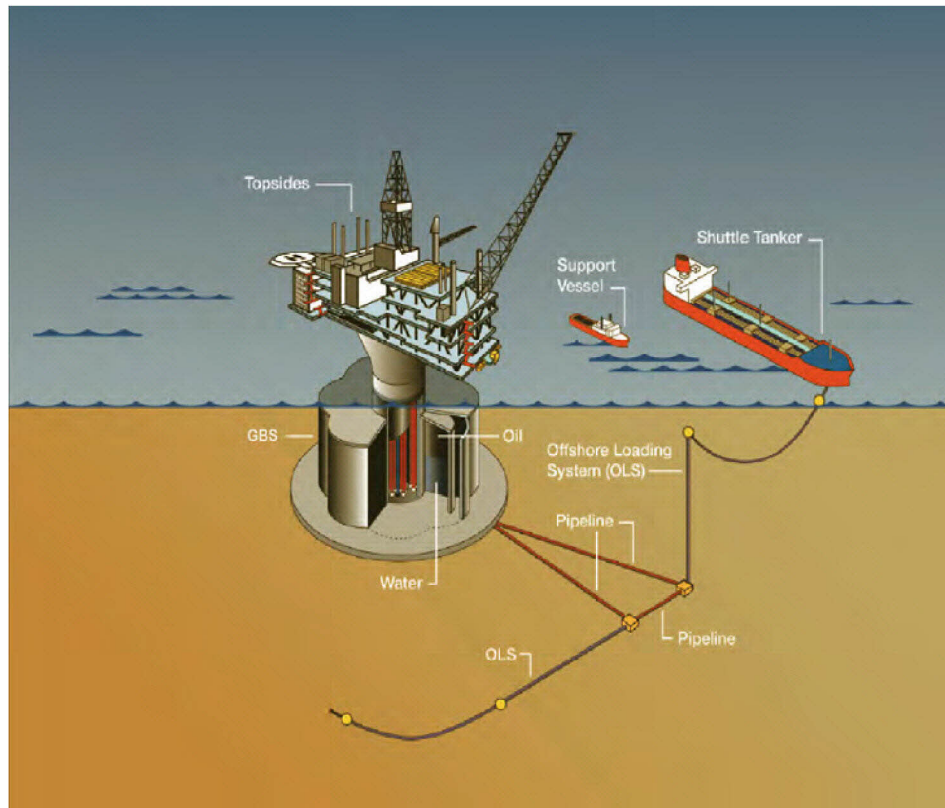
Stand-alone Gravity Base Structure Preliminary Development Layout
